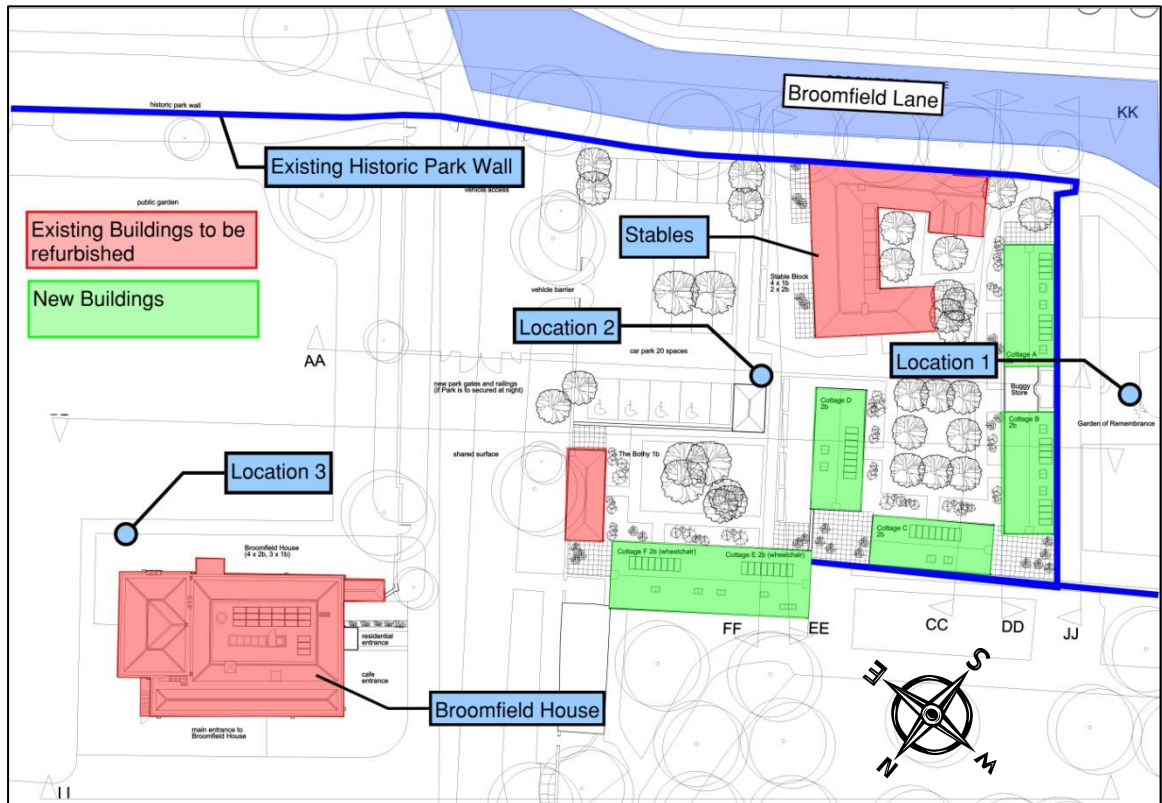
Site Plan Showing Measurement Locations and Other Points of Interest
